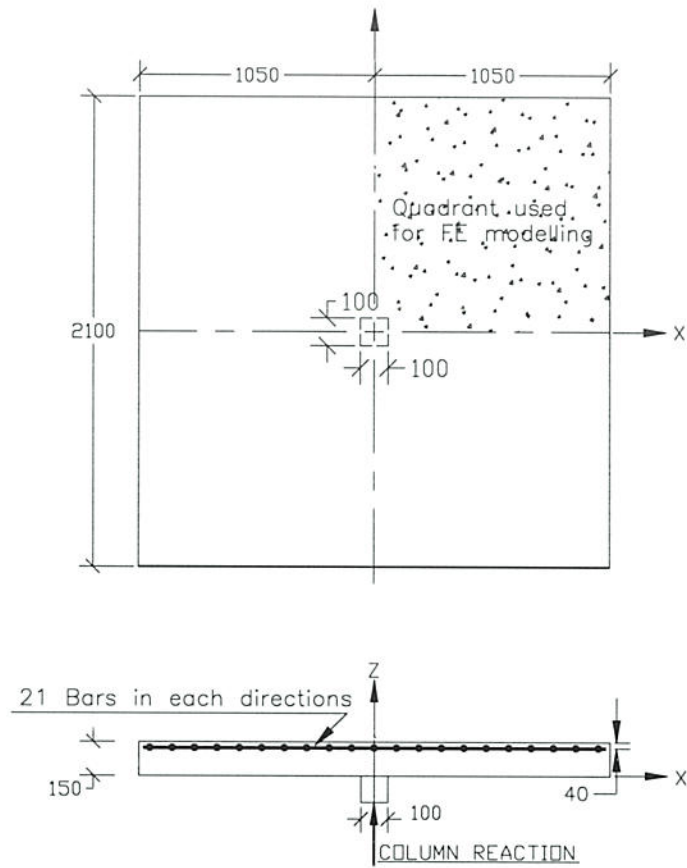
Reinforced slab resting on square column and its cross-section.
